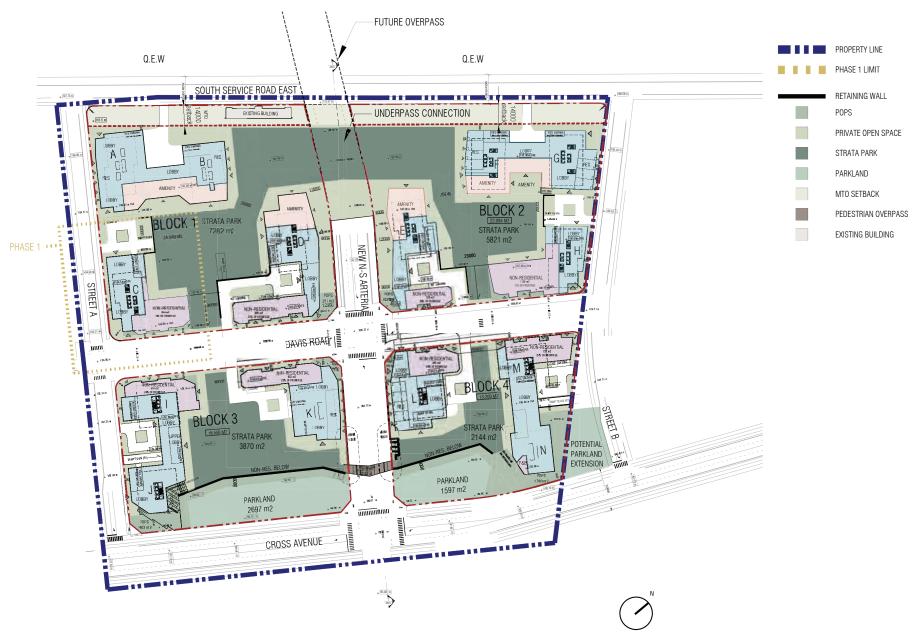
Proposed Ground Floor Plan created by Graziani & Corazza Architects
